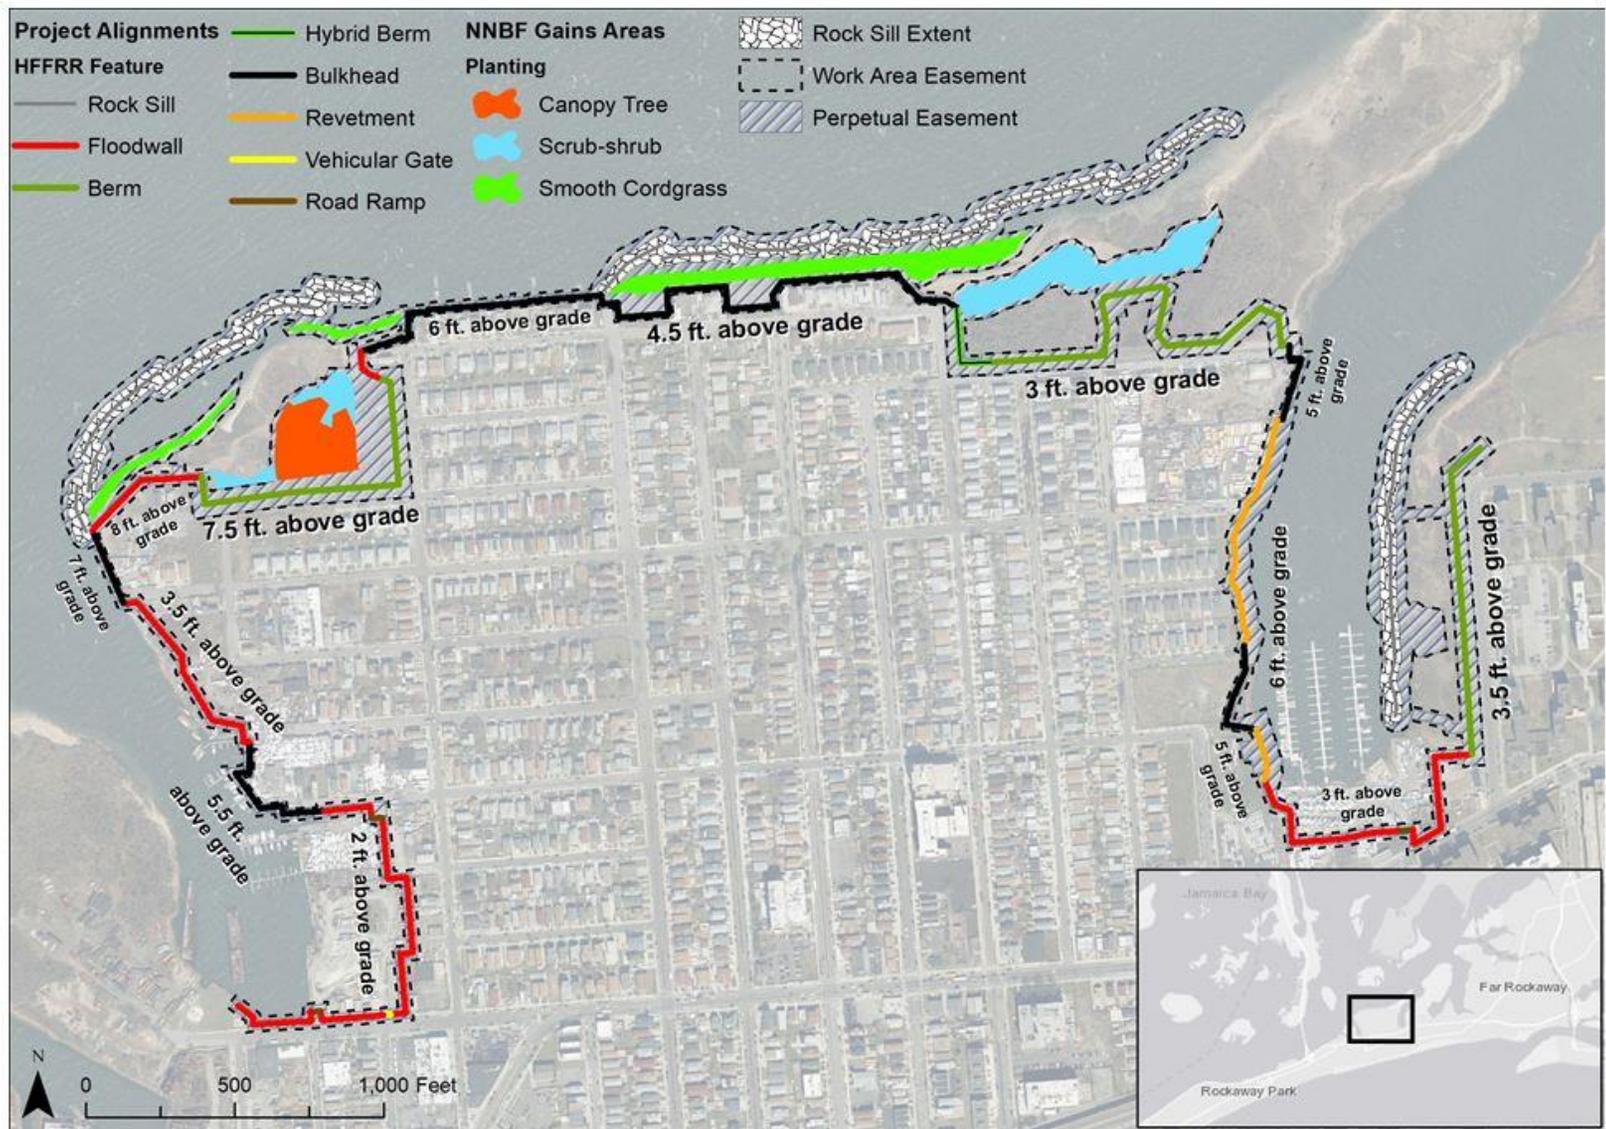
Mid Rockaway – Arverne Area HFFRRF Project Plan
